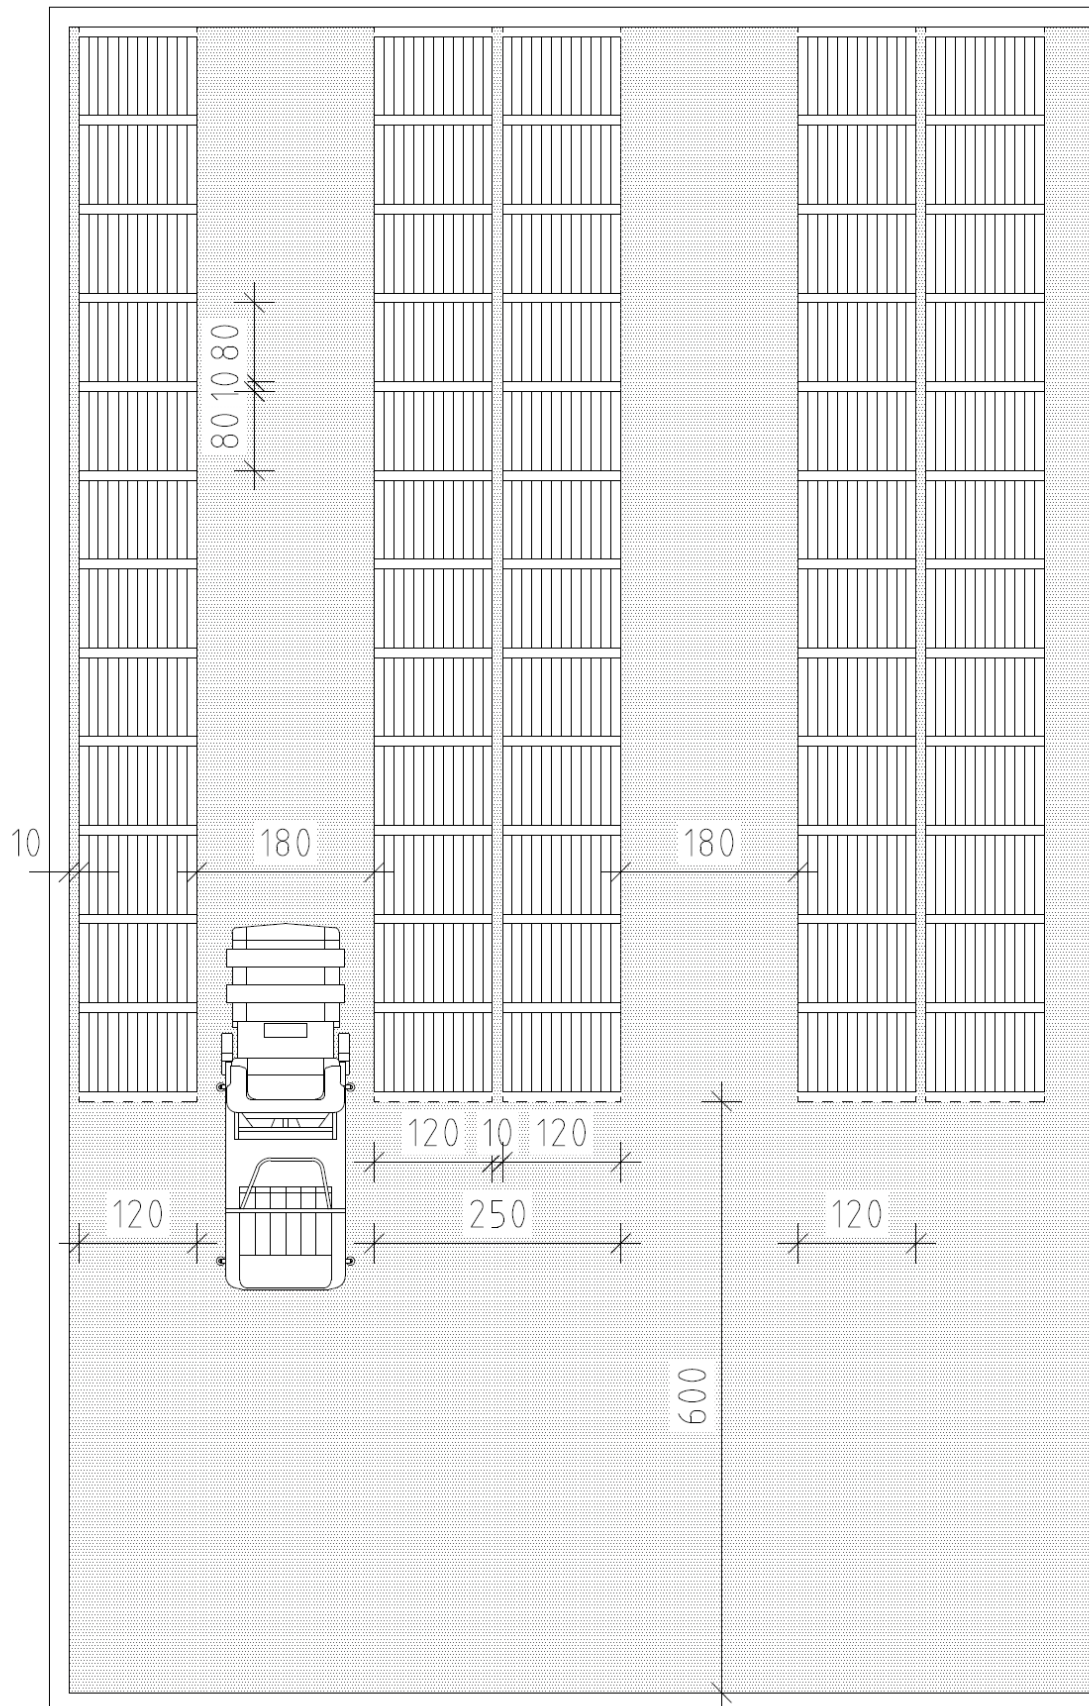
Presentation of pallet stacking in high bay warehouse – floor plan
